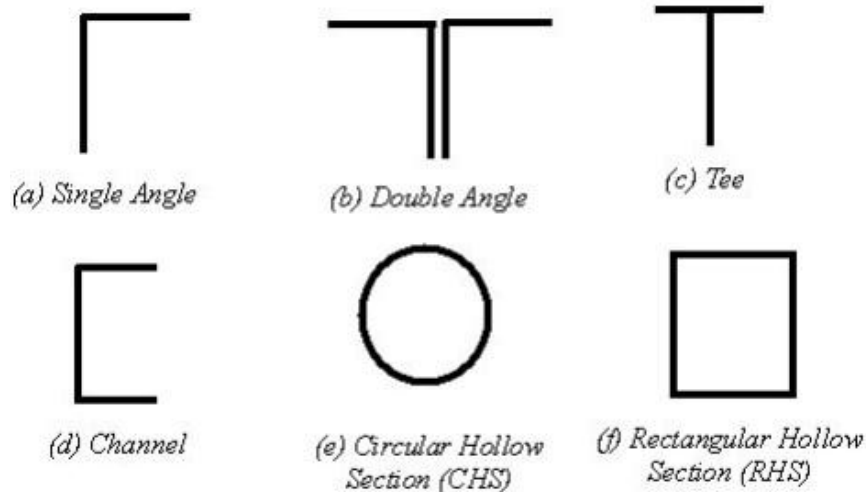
Cross Section Shapes for Rolled Steel Compression Members
